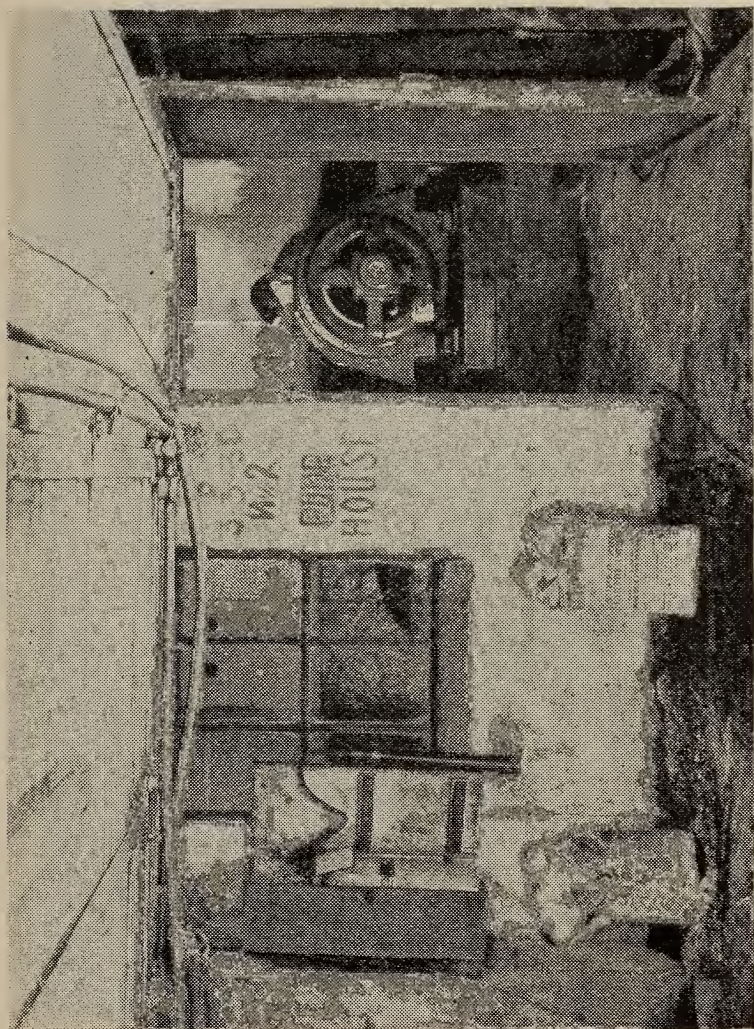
Underground substations should be of fireproof construction, with wiring properly installed on insulators and frames of all equipment effectively grounded.
